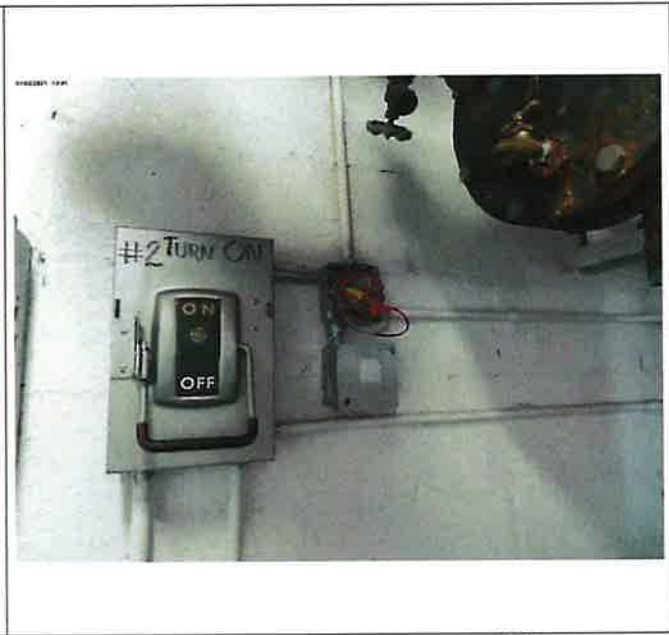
Opening in junction boxes/enclosures (Item #10.f.2)
